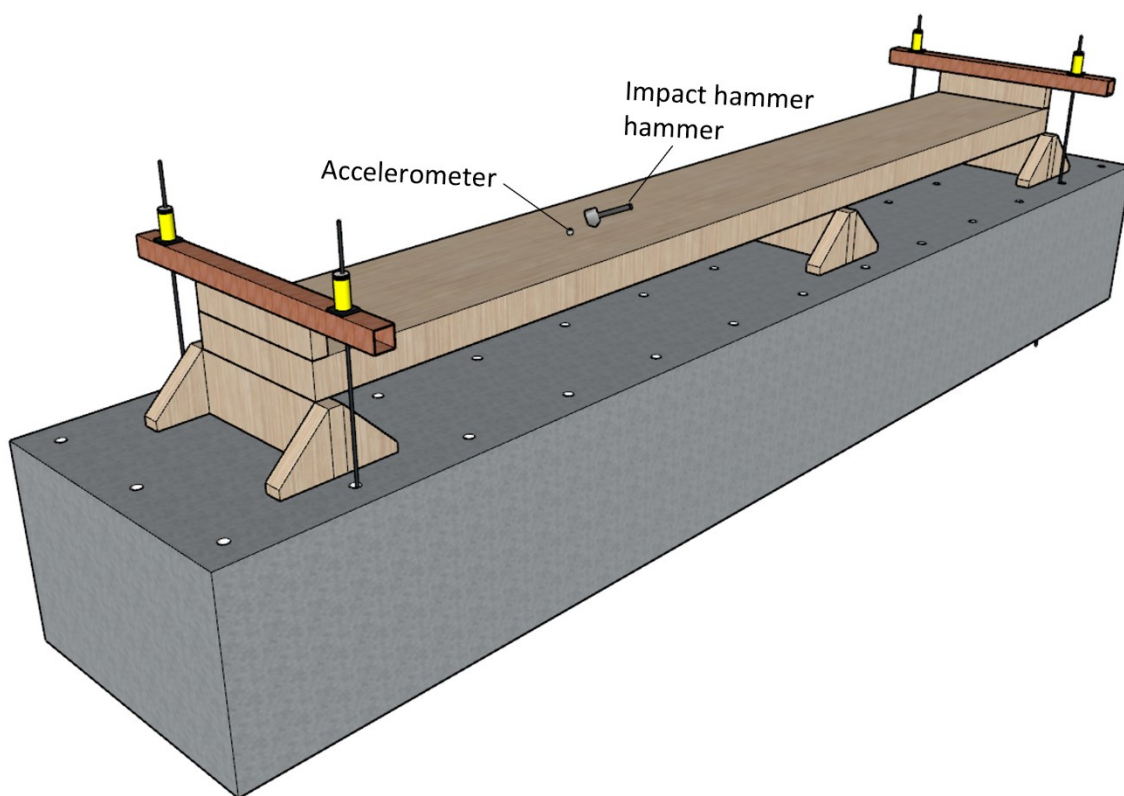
Test set-up of impact hammer modal test of two-span and wall supported floor
